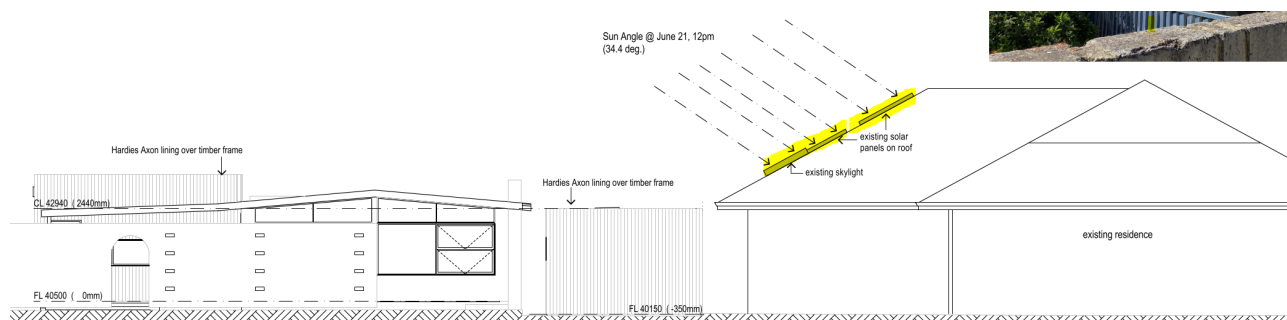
Subject site (left dwelling) and No.30 Bromley Road (right)
